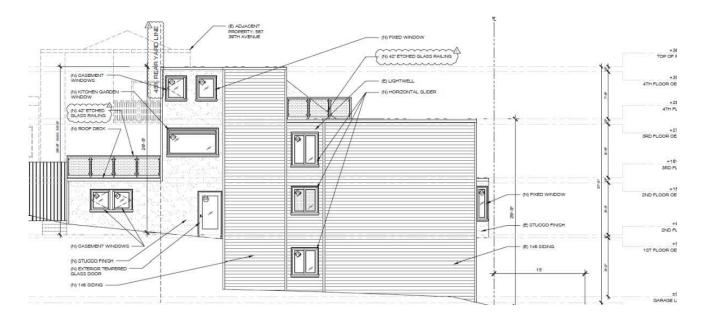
Proposed East Elevation -- two stories would be added rising to 36.5'.
